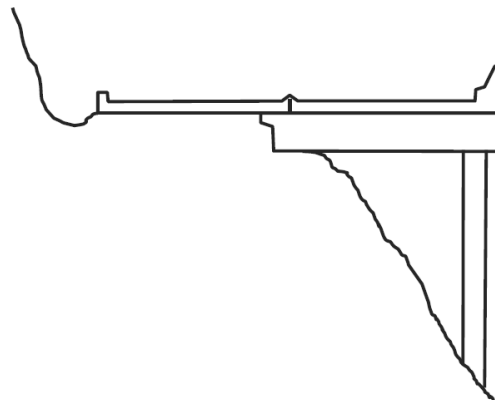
Cross-section view of a sidehill bridge (Example 1)
